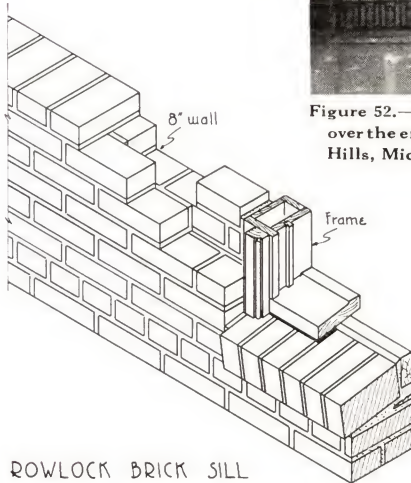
Perspective sketch of rowlock brick sill in an 8-inch brick wall.
